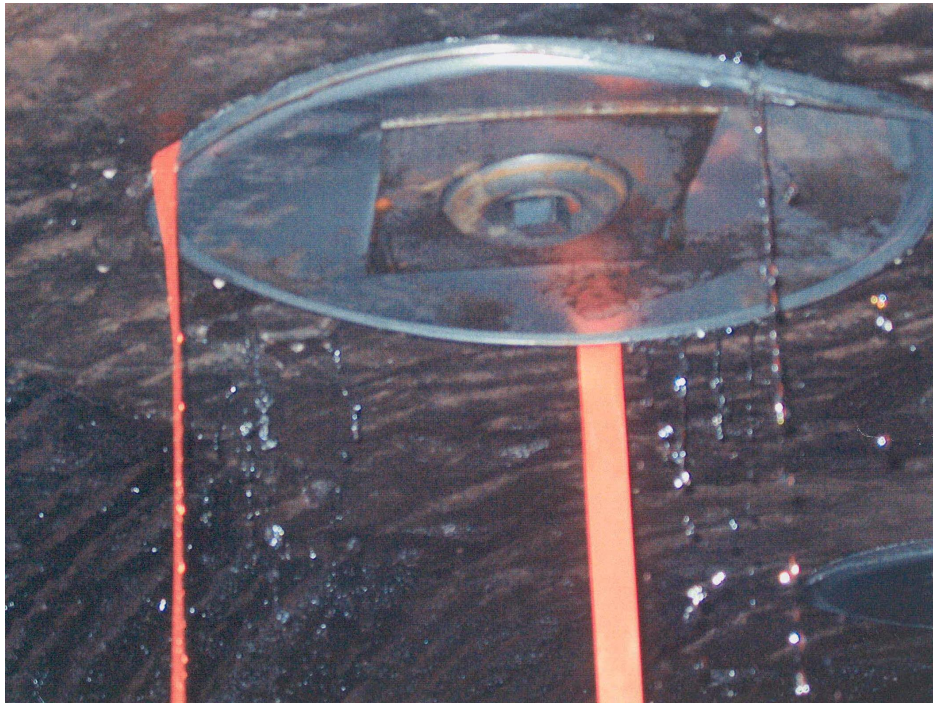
Water streaming from a newly-installed roof bolt. Photo courtesy of Mike.
